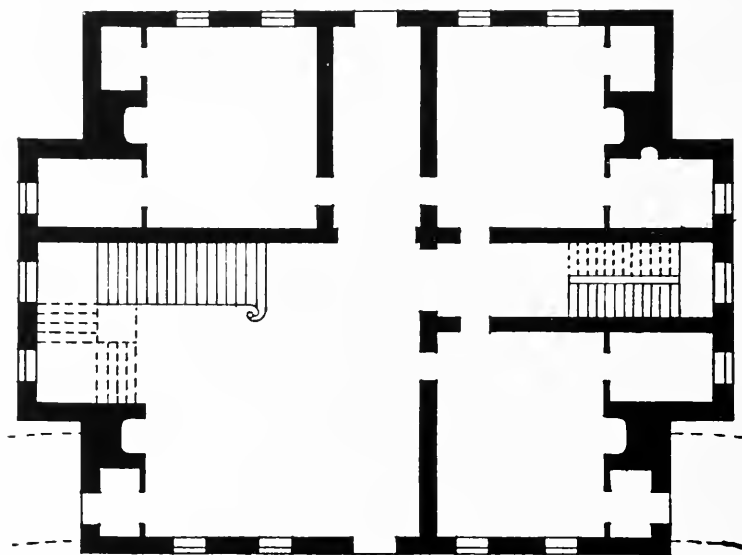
First floor plan, Rosewell, from Waterman, p. 109. The top of the plan represents the south side of the house.
